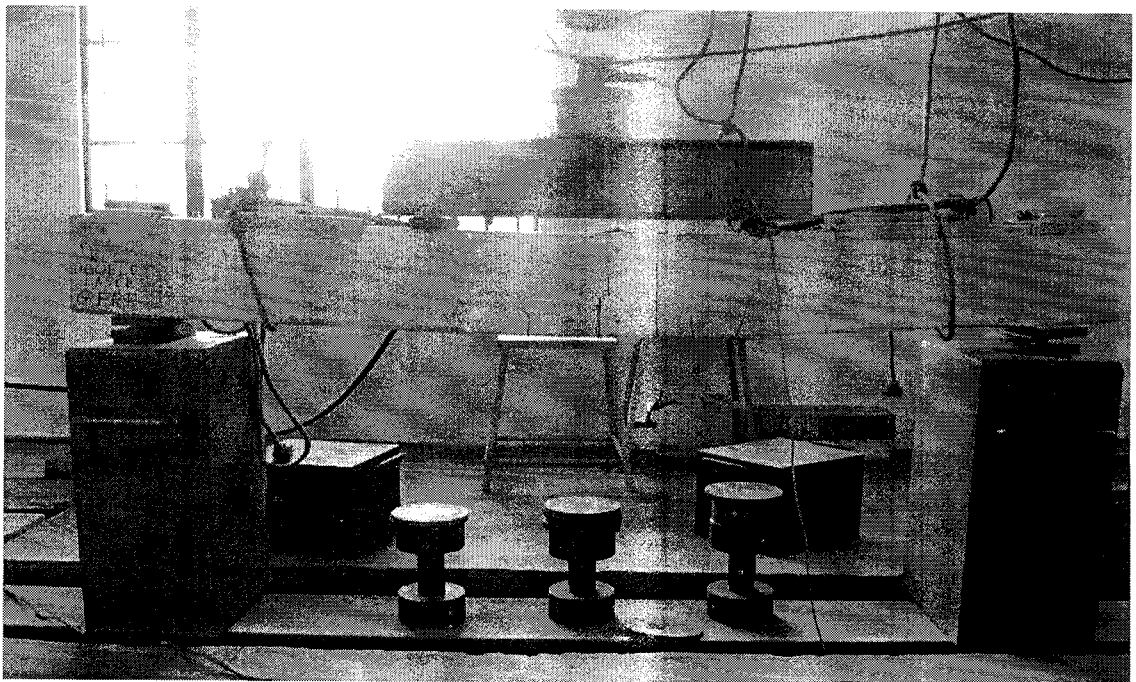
Typical failure of beam with 2 layer of woven rovings 1(B)
